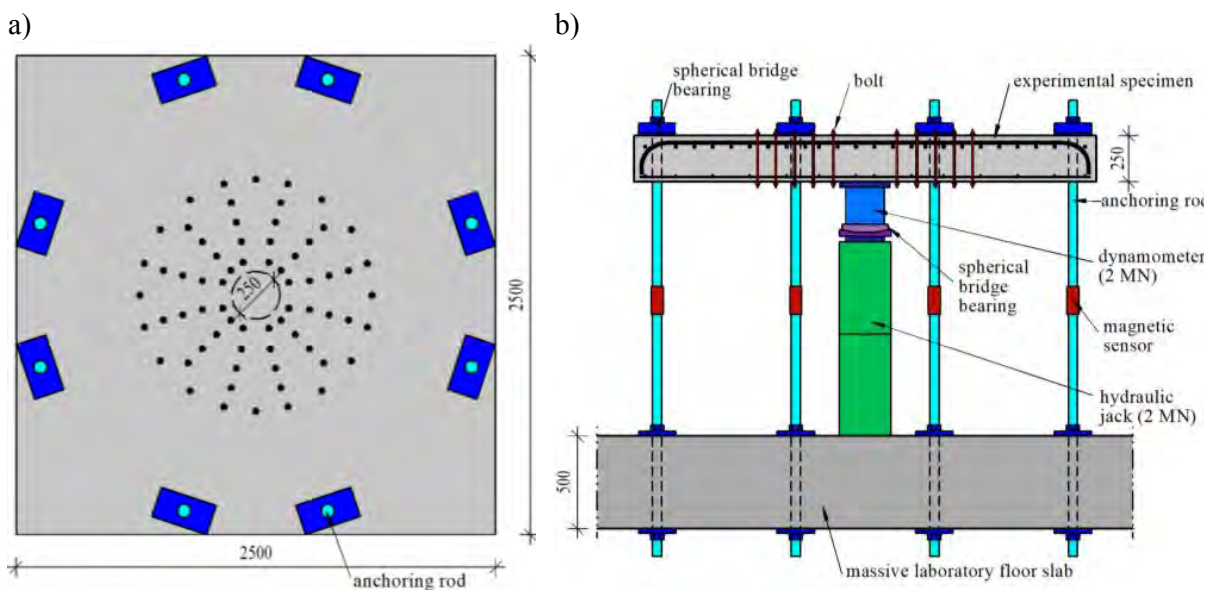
Test setup (dimensions in mm) a) top view, b) section.
